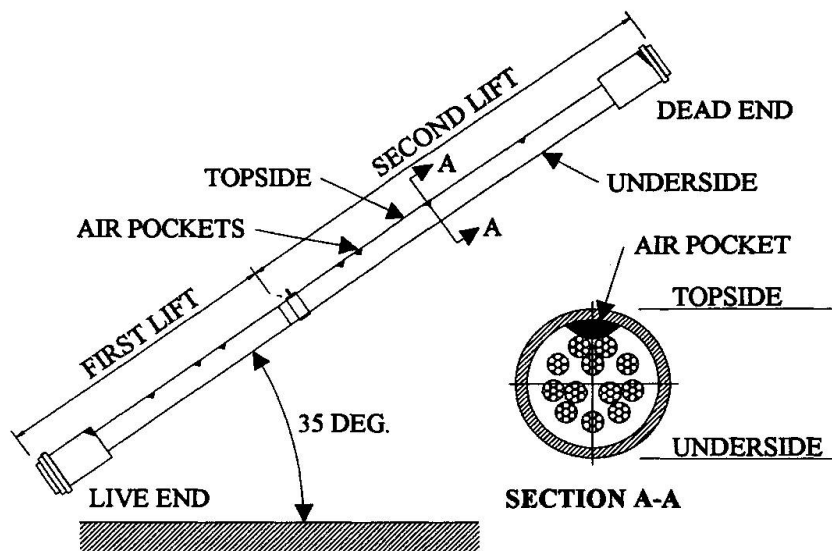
Schematic Elevation of Specimen in Grouting Position
